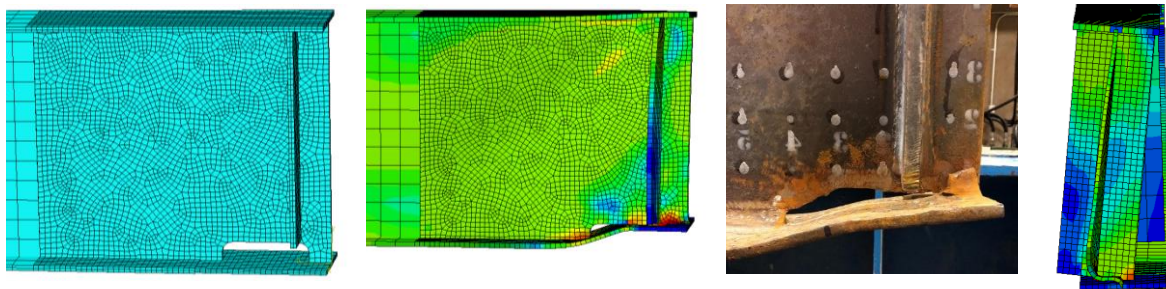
Girder 1A loaded end elevation with maximum (von Mises) stresses plotted.
